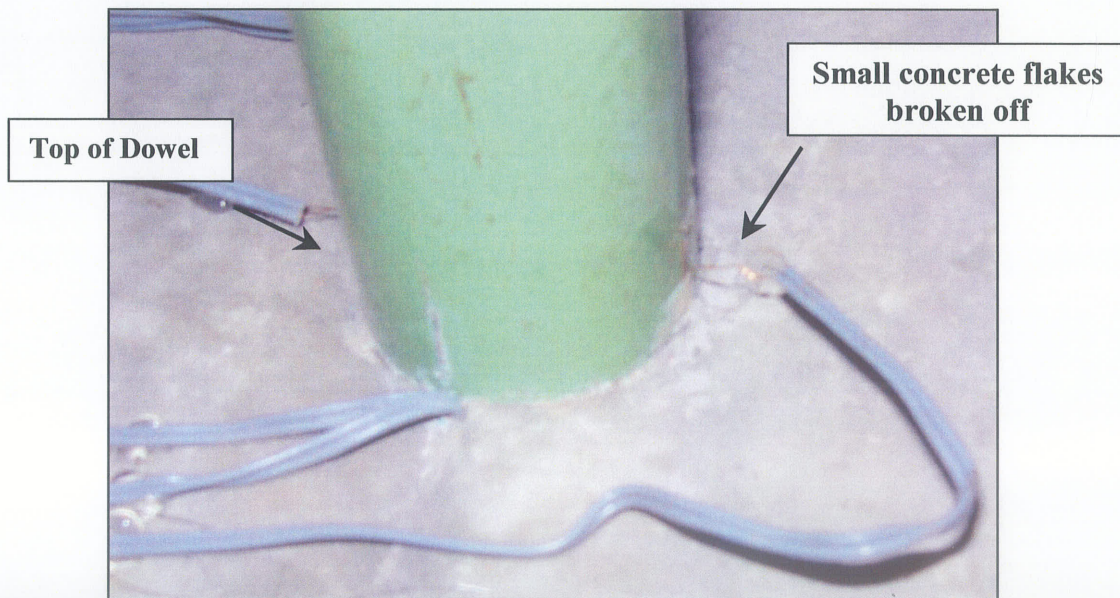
Damage to concrete below 38-mm steel dowel at failure (100 kN) – Phase II
